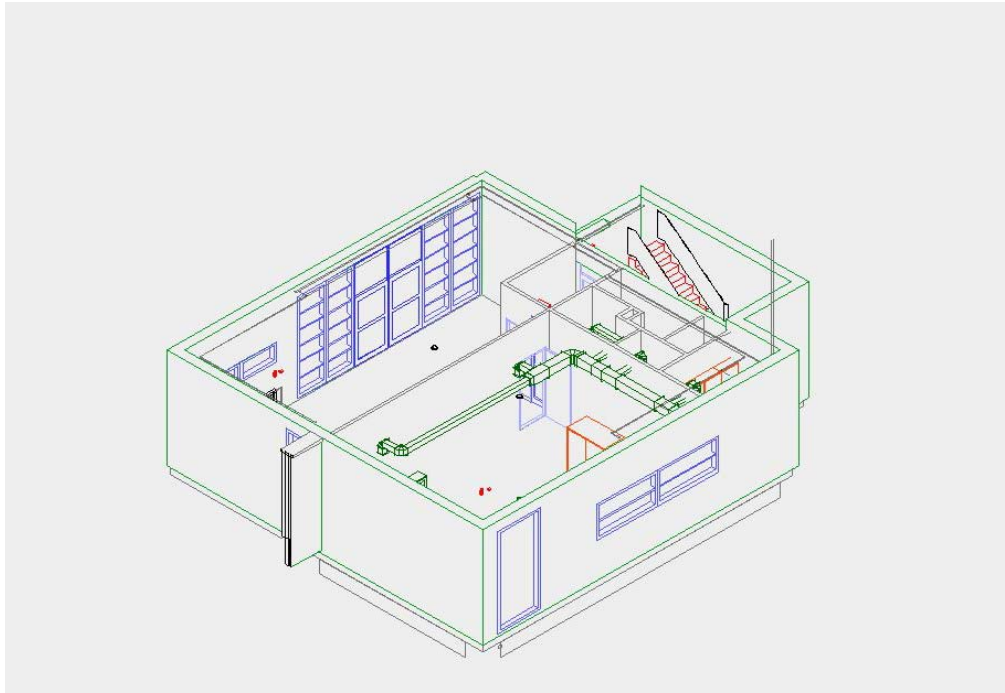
Project Model layout Ground Floor (Hot linked HVAC file)
